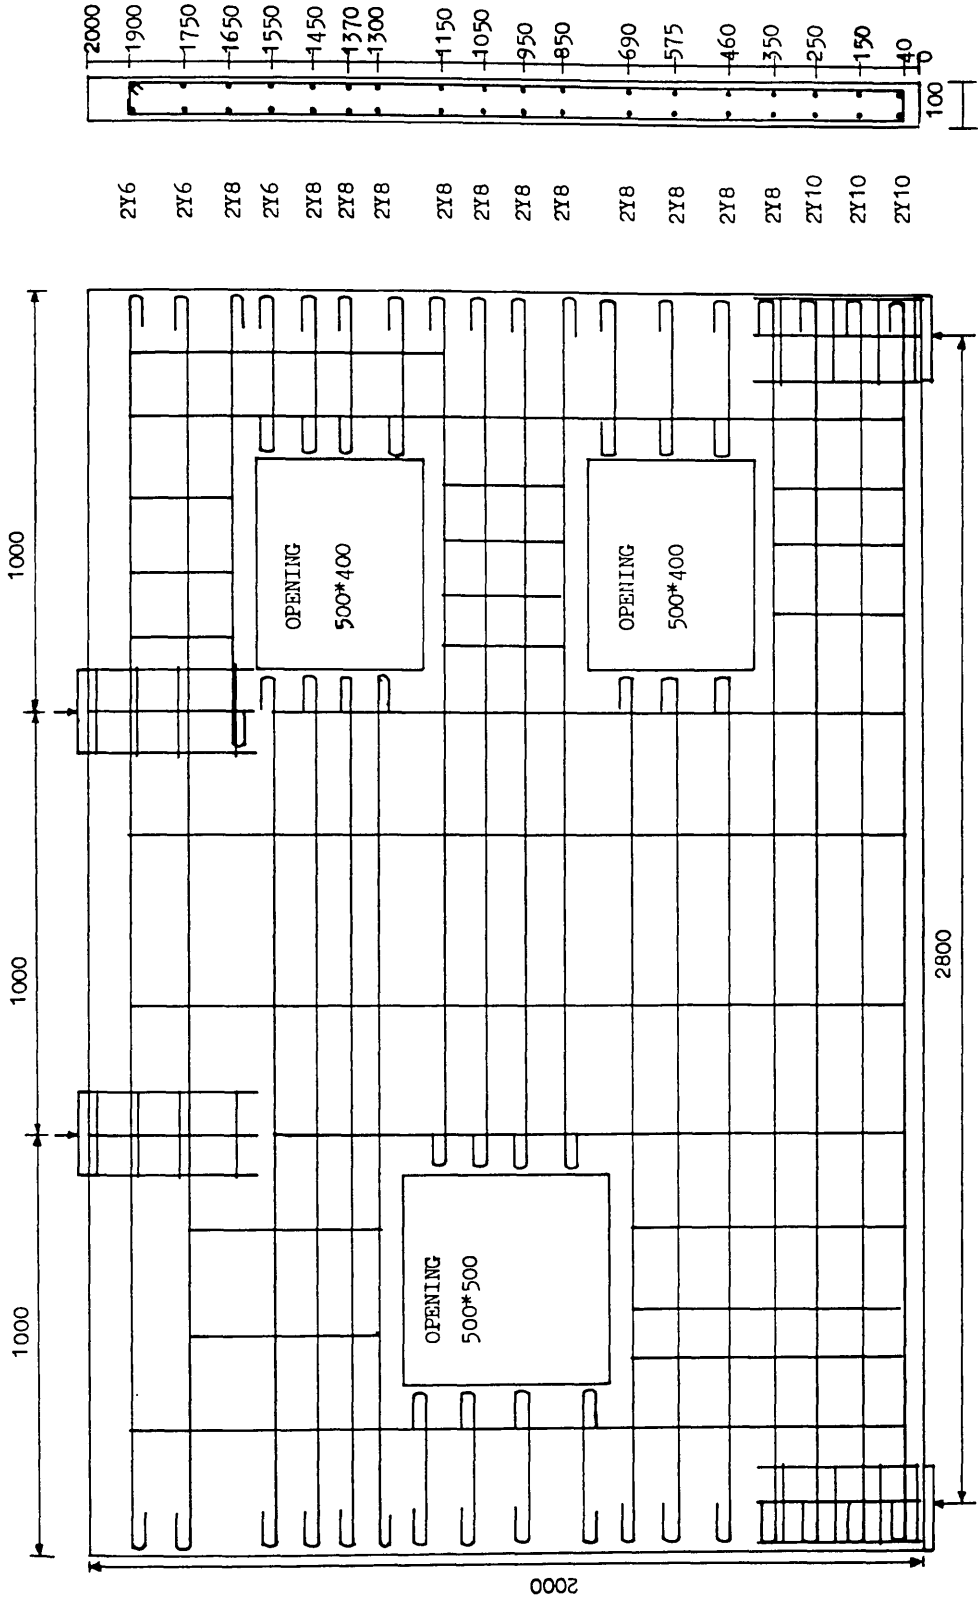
Dimensions and reinforcing details of girder TRGRAS7
